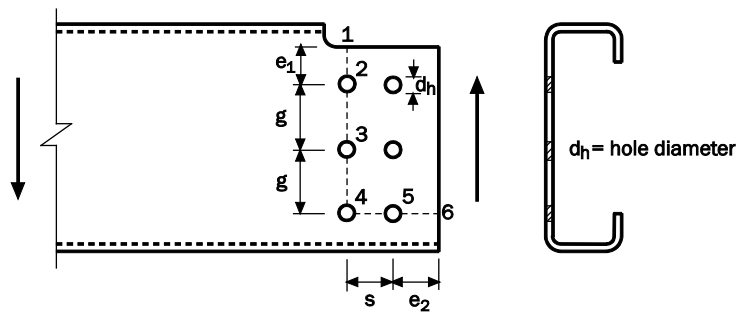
Potential Failure Path of Coped Stiffened Channel (Block Shear Rupture)
